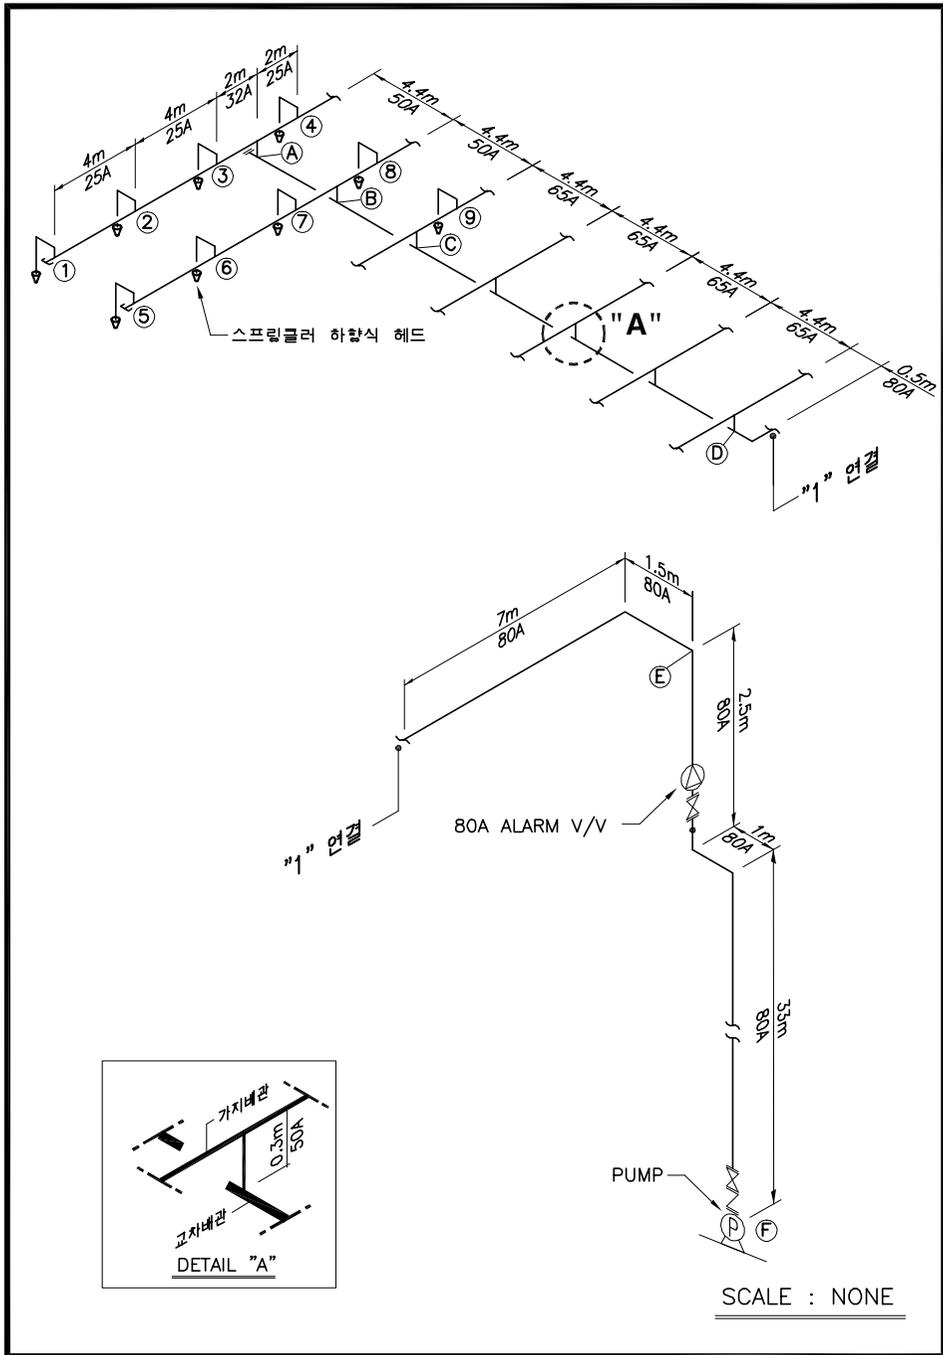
Isometric View of Hydraulically calculated Sprinkler System
